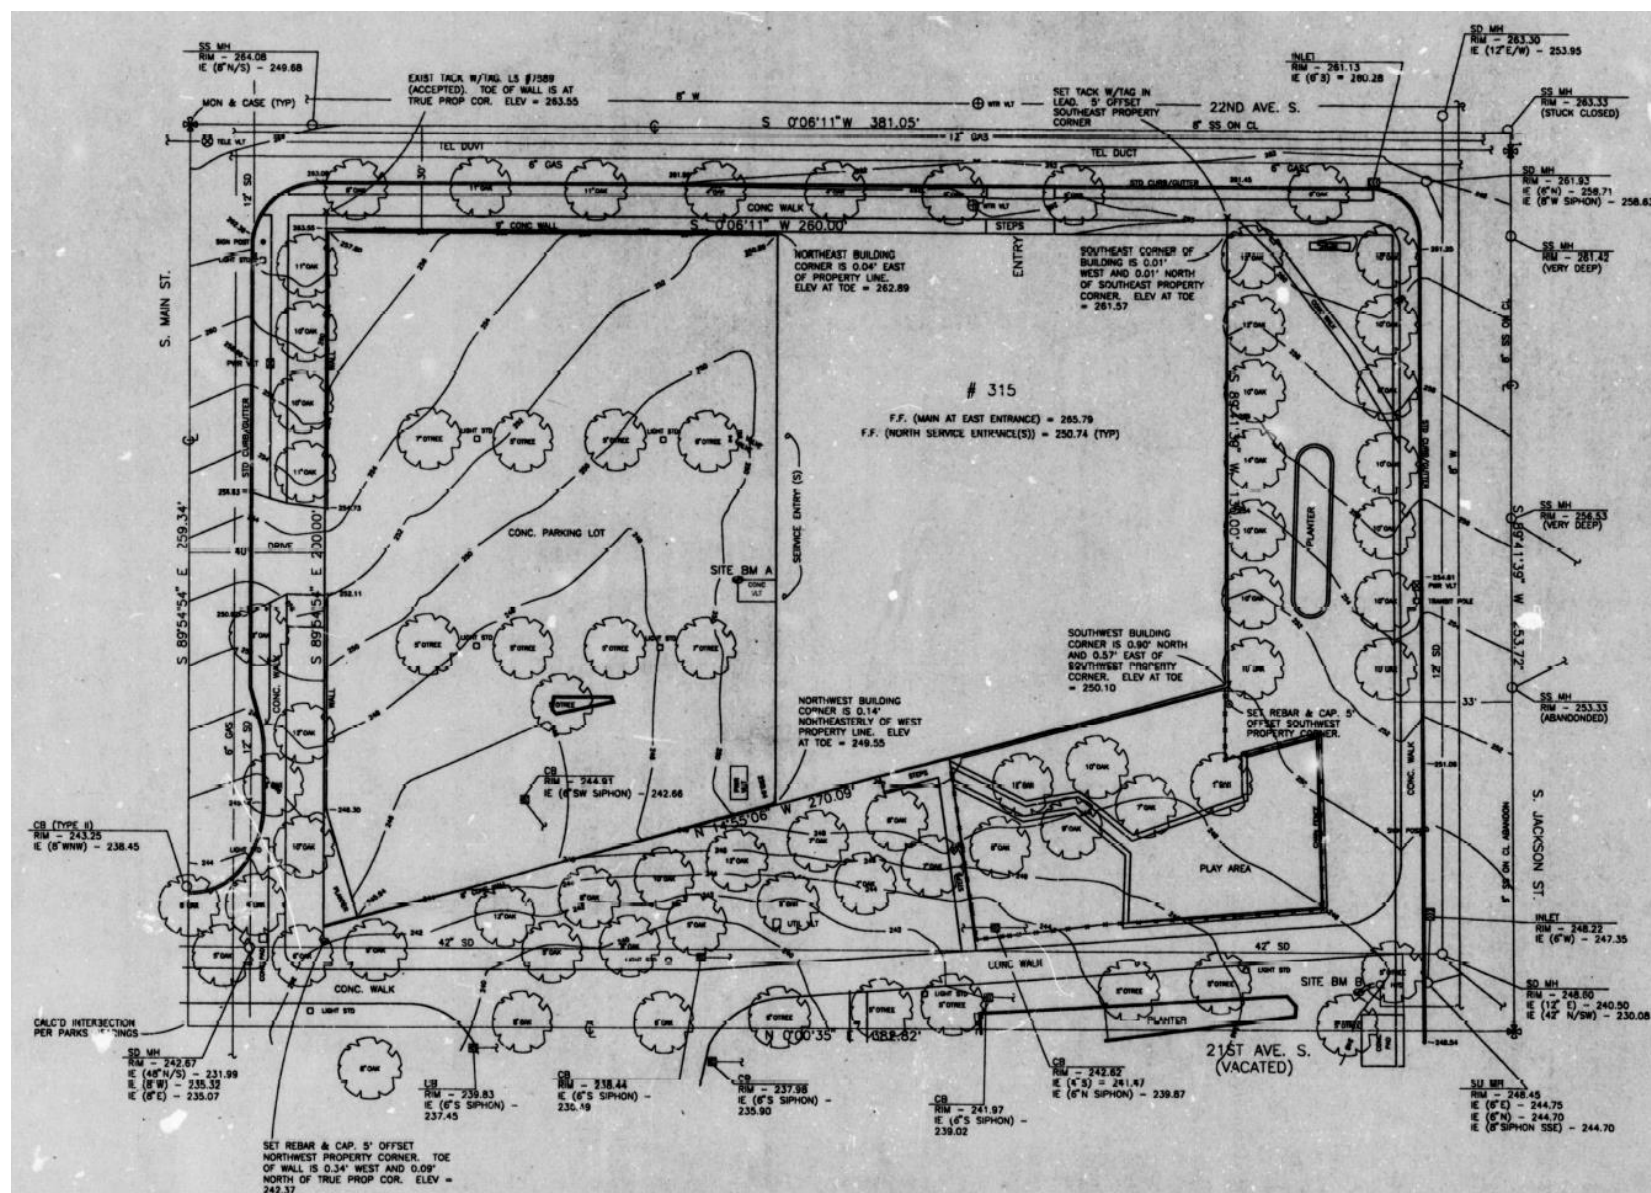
Site Plan, 1996 Renovation, Johnson Architecture & Planning, 1995
